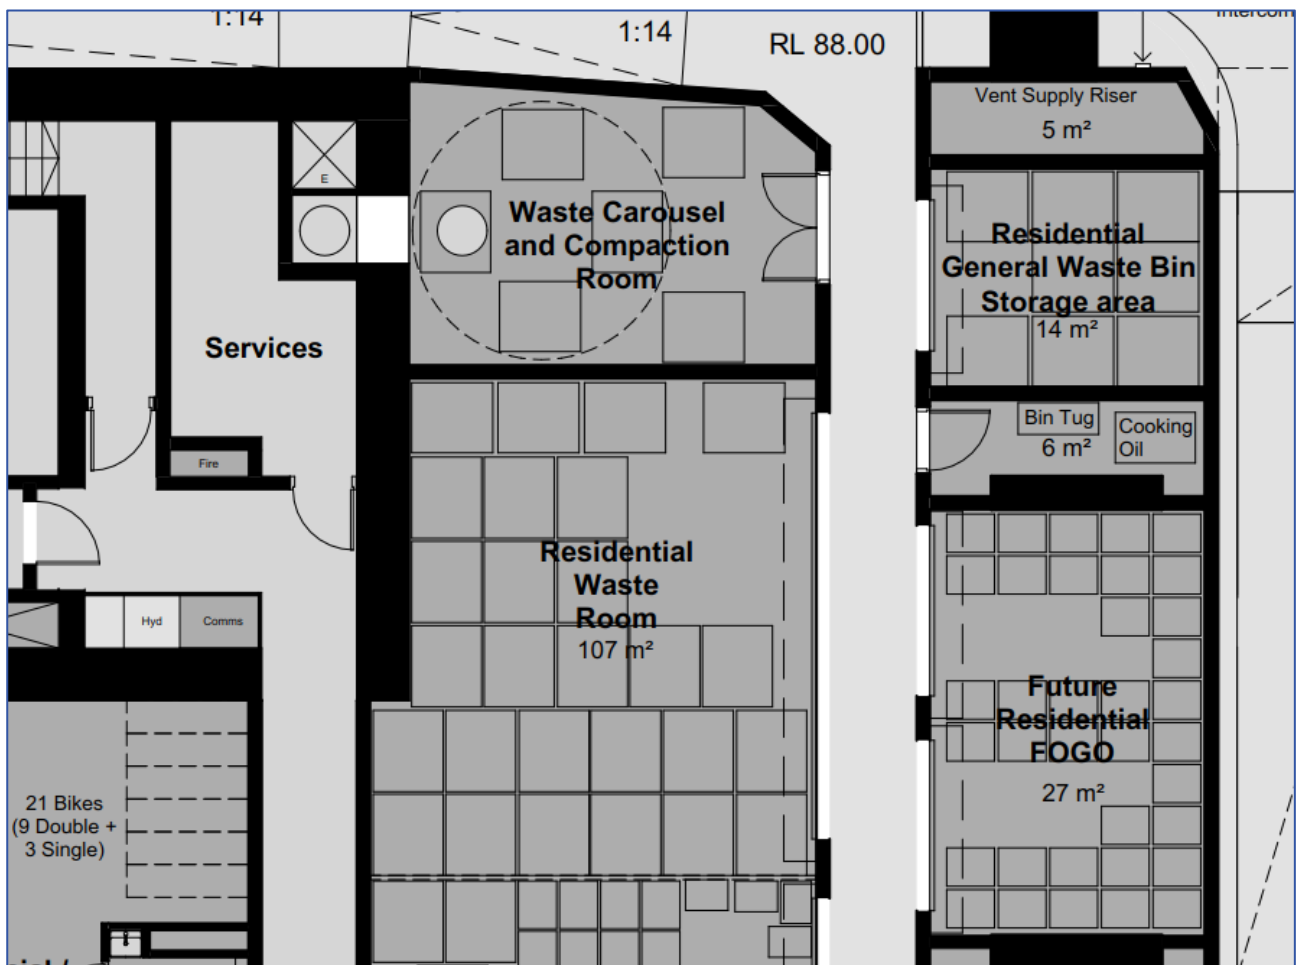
Residential Refuse Storage Room (residential waste room)
